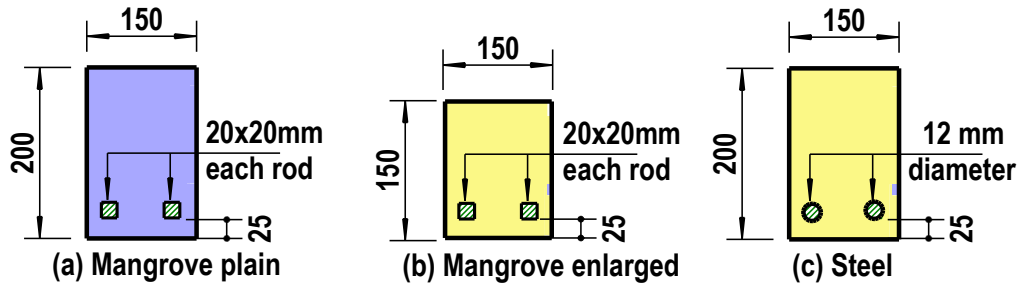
Concrete beams reinforced with mangrove (a and b) and steel (c).
